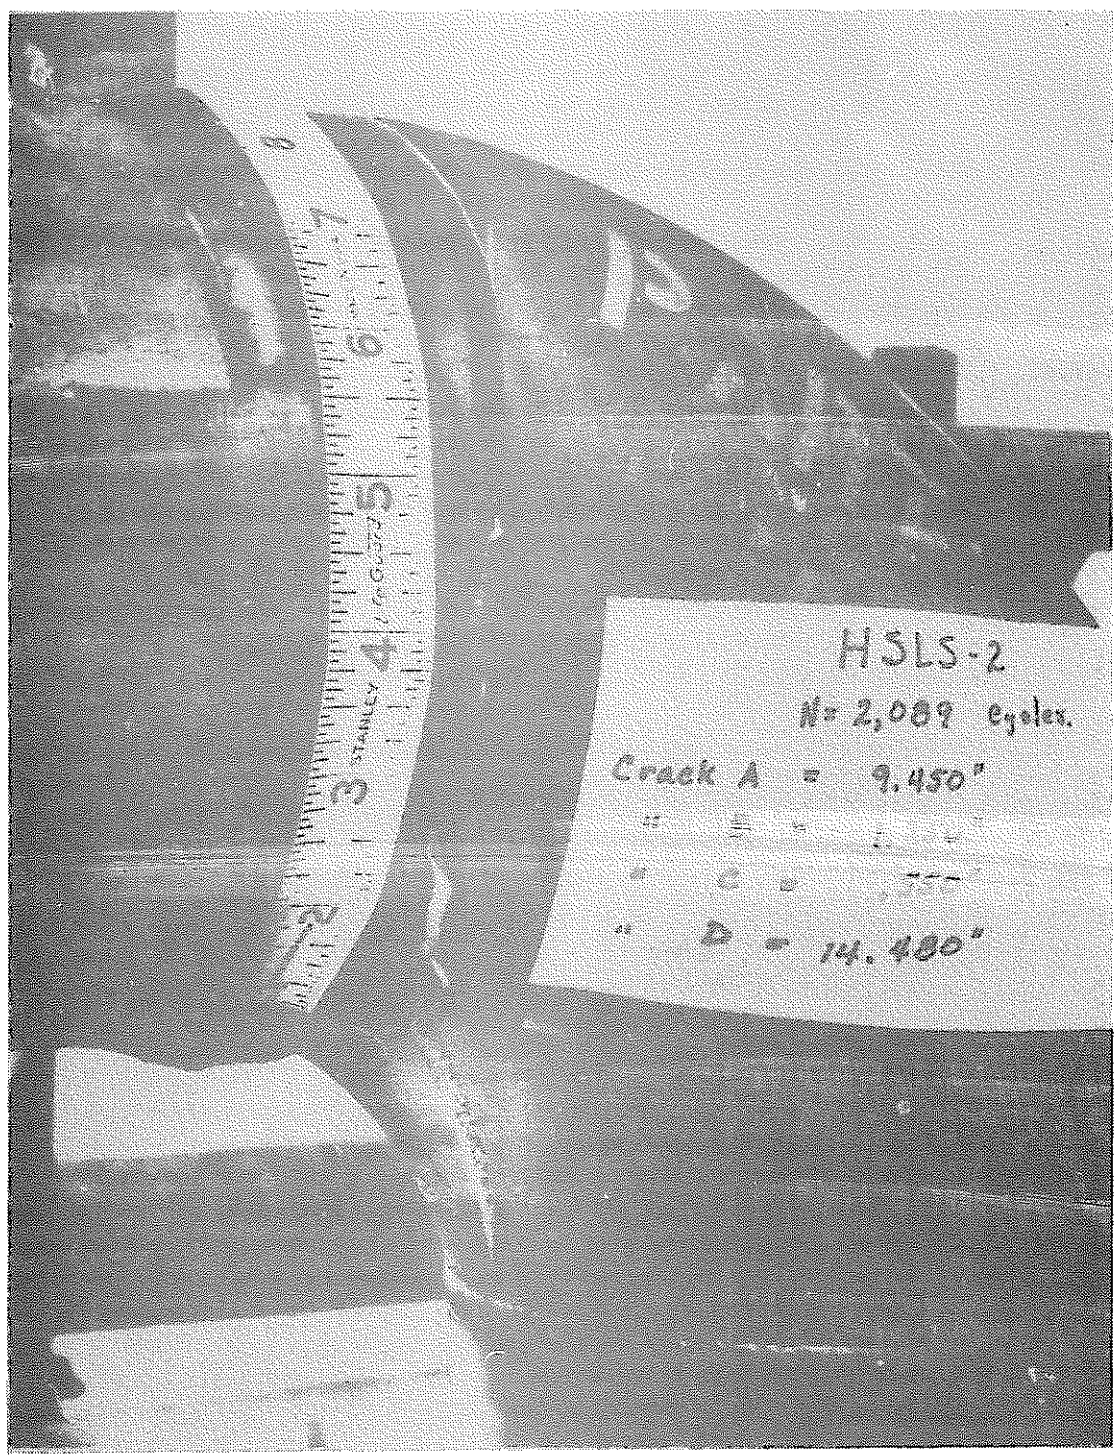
Final Fracture Geometry (Bottom Side), Sample HSL-2, After 2089 Cycles
